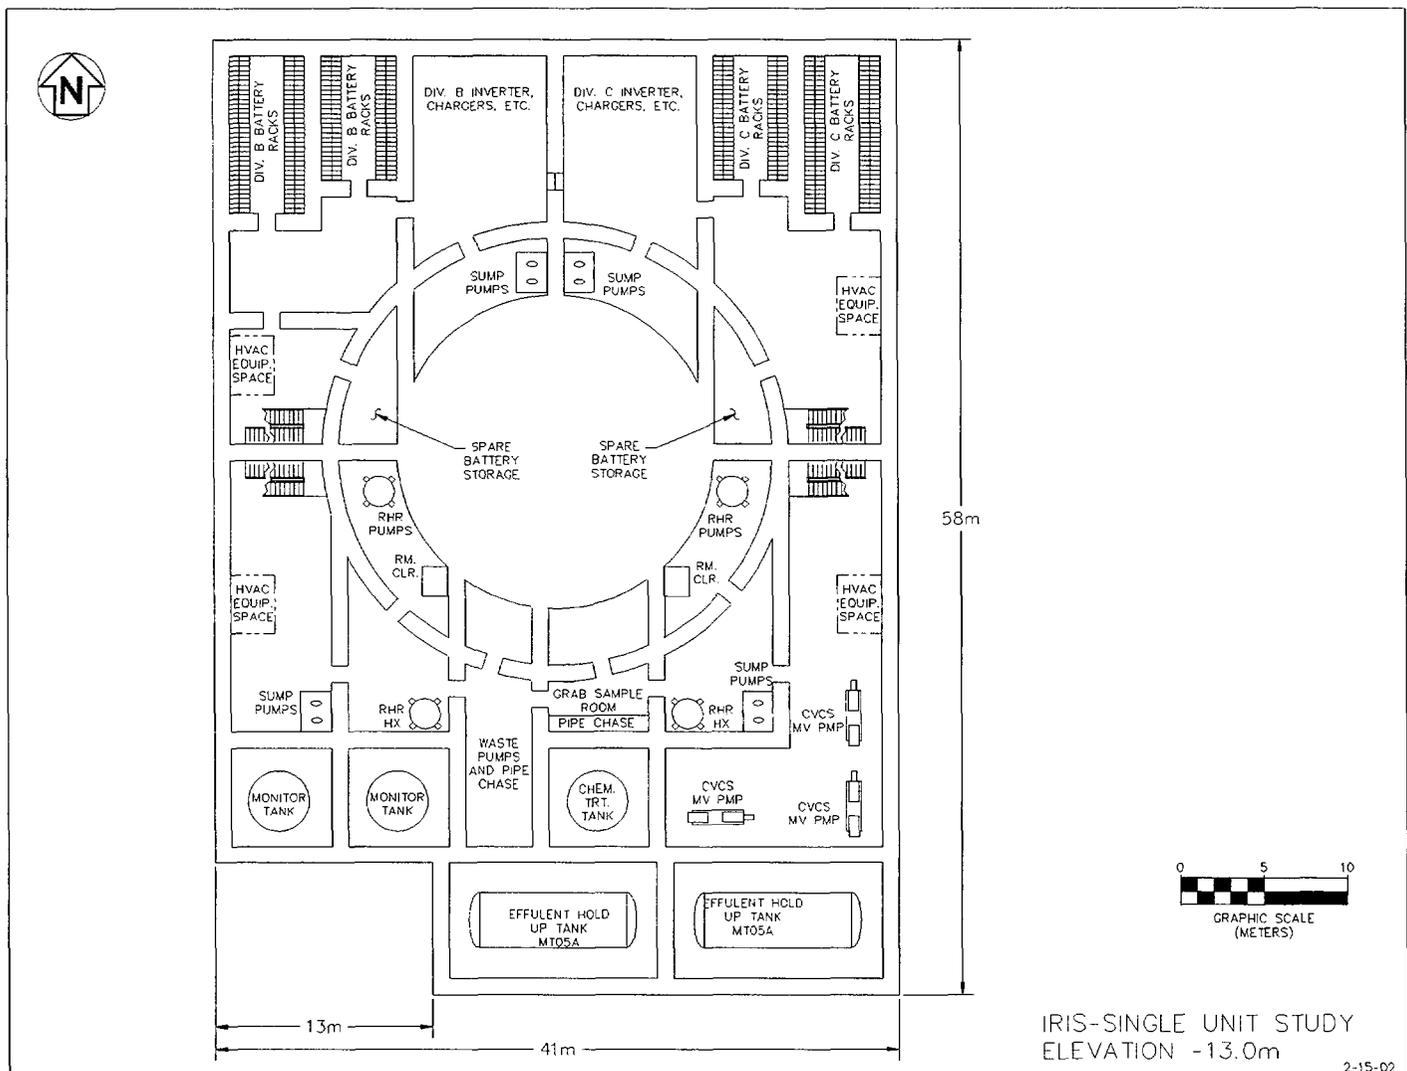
, IRIS Auxiliary Building General Arrangement at Elevation -13 Meters
